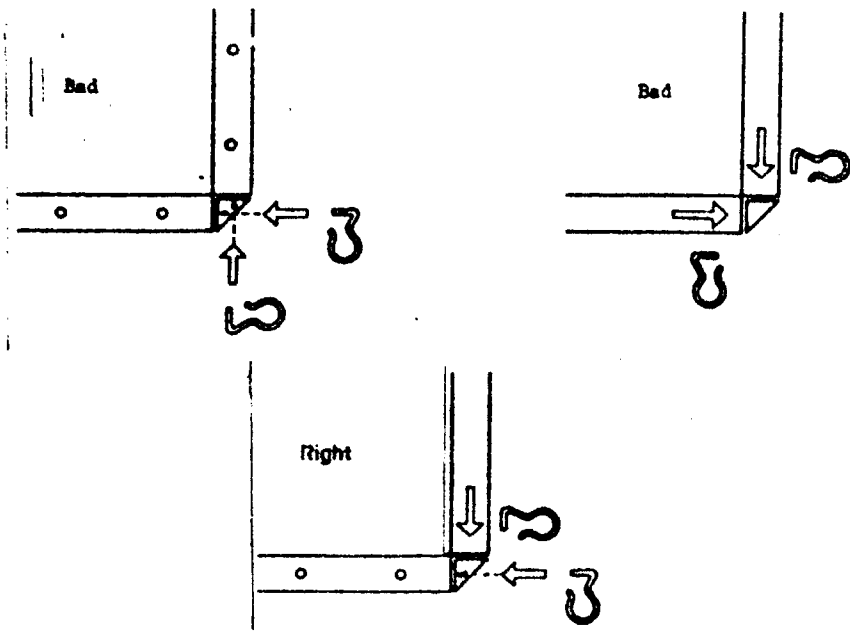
ARRANGEMENT OF U-CLIPS OF COLUMNS & WALLS
